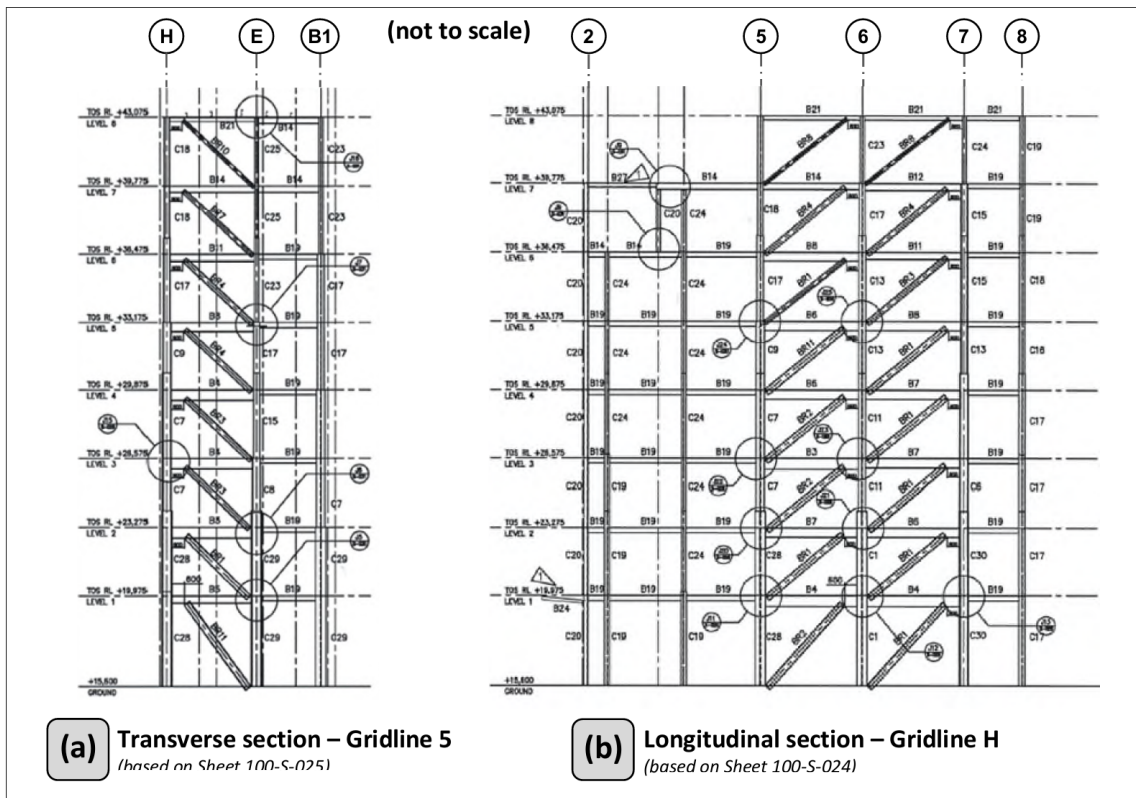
Frame elevations along Gridlines 5 and H – taken from building consent Drawings 100-S-024 and 100-S-025
